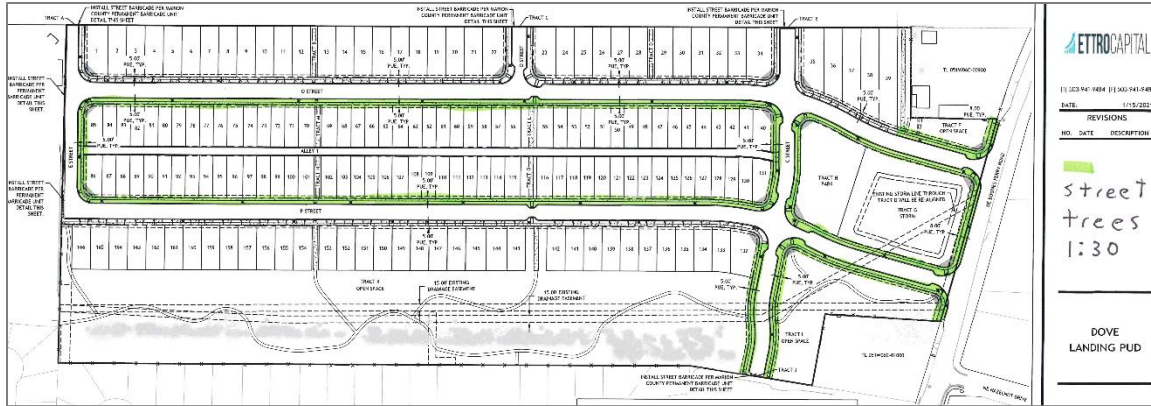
Street Tree Min No. (green: equal to 1 tree per 30 ft of block frontage)
